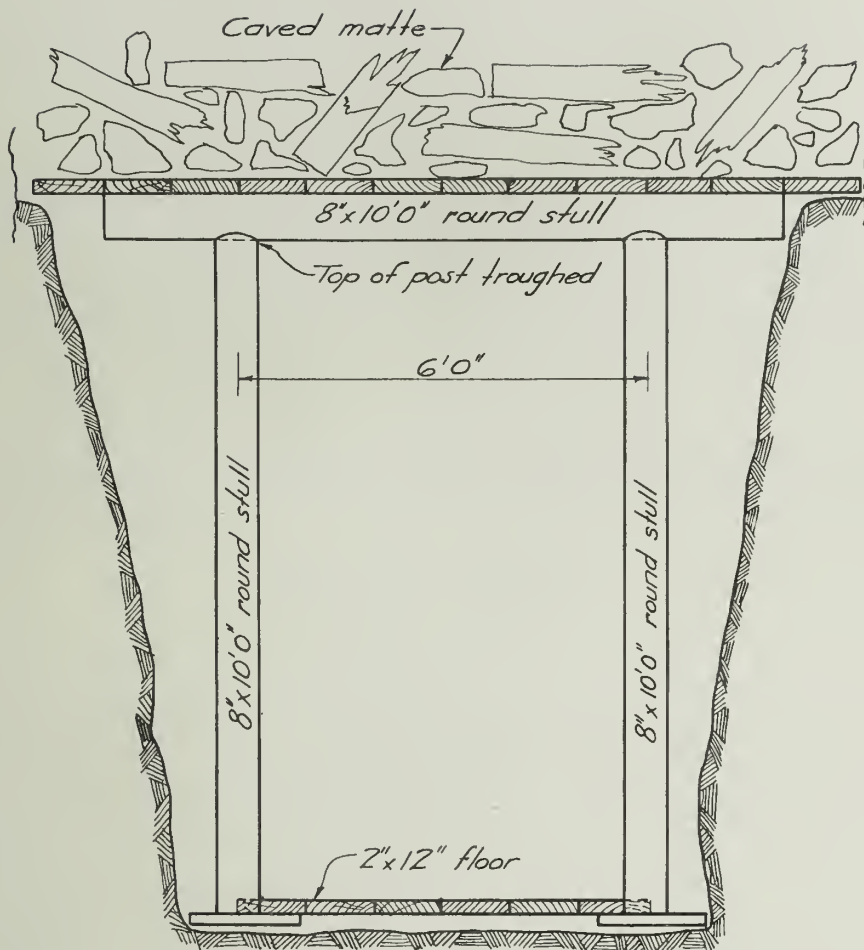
Typical top-slice timbering, used as shown in advance, at intervals of 5 feet. Extended laterally in stopes
